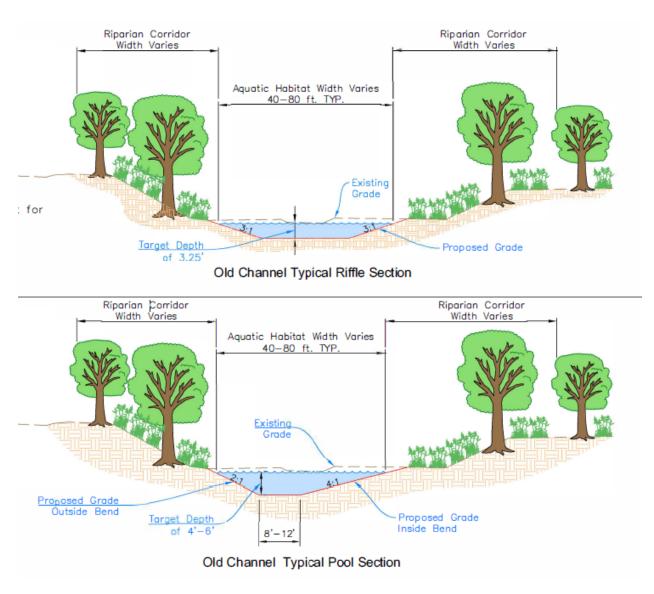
Alternative A2, A3 and A4 Old Channel Typical Sections
